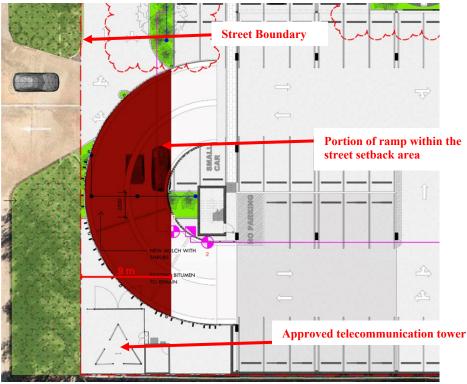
Floor plan showing car parking ramp and 9m setback distance
